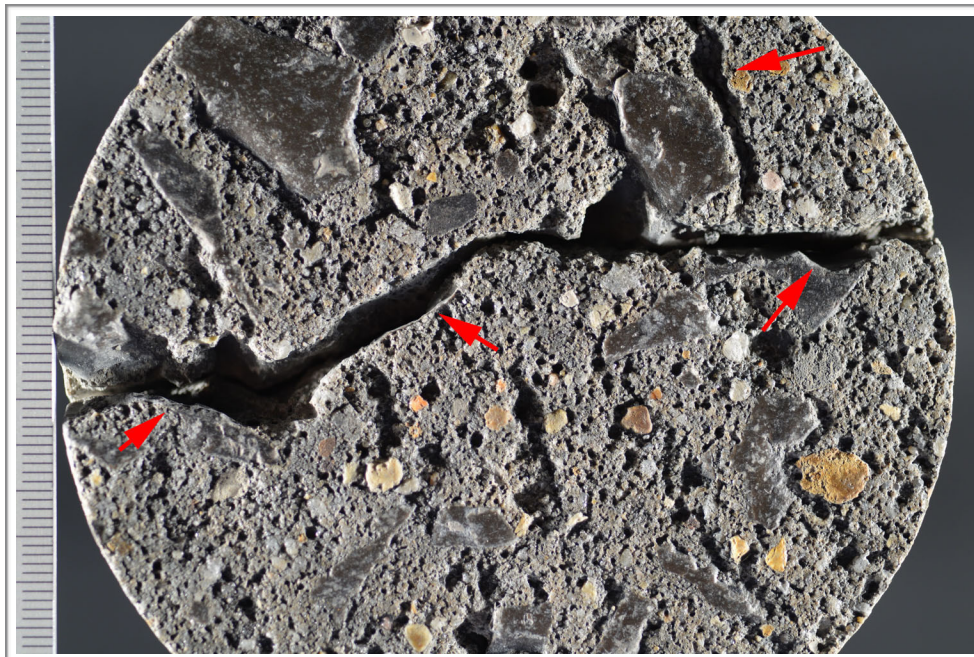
Photograph showing cracks (red arrows) on the top surface; scale in millimeters.
